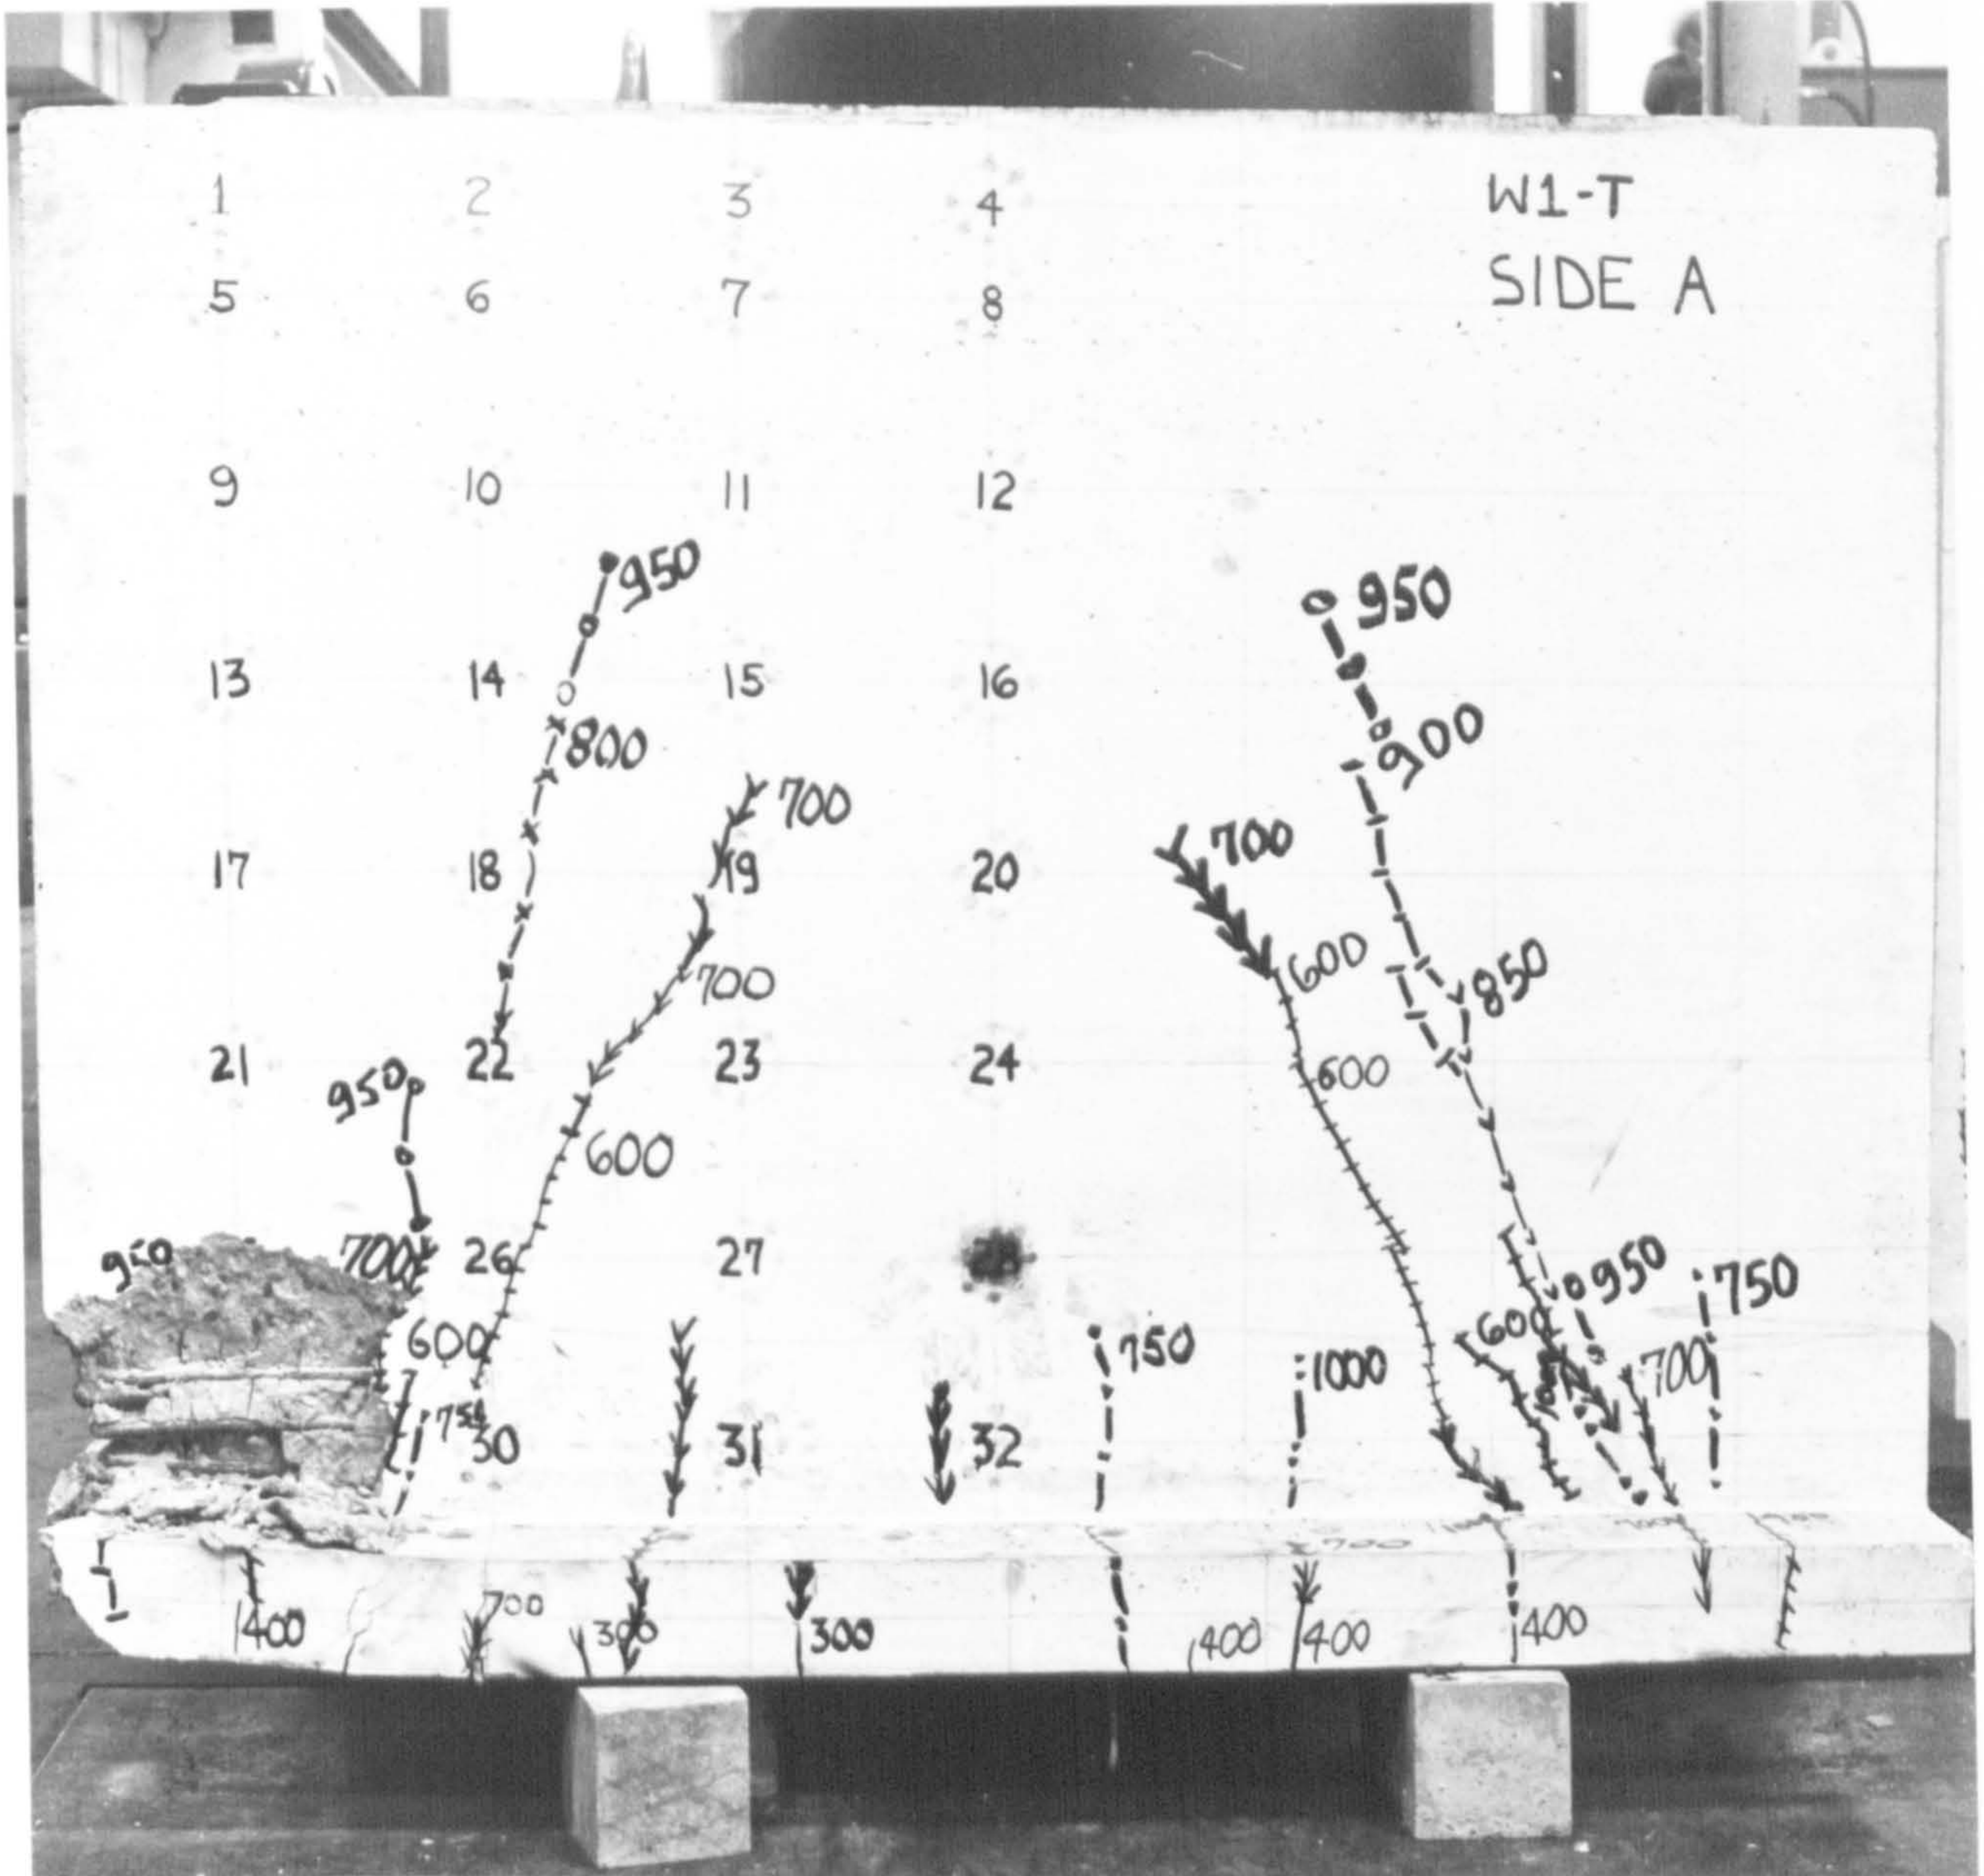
Final crack pattern at failure for specimen W1-L1
